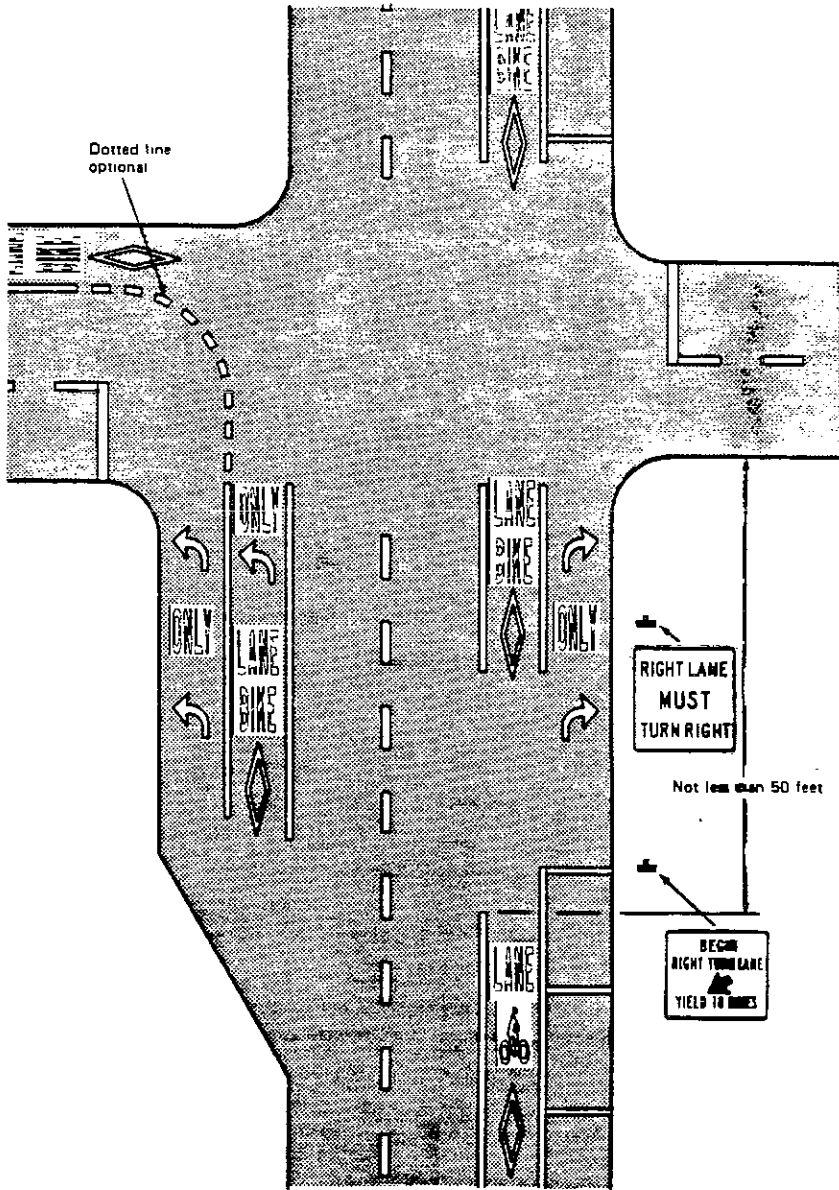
Intersection pavement markings—designated bicycle lane with left turn arrows, heavy turn volumes, parking, one-way traffic or divided roadway.
